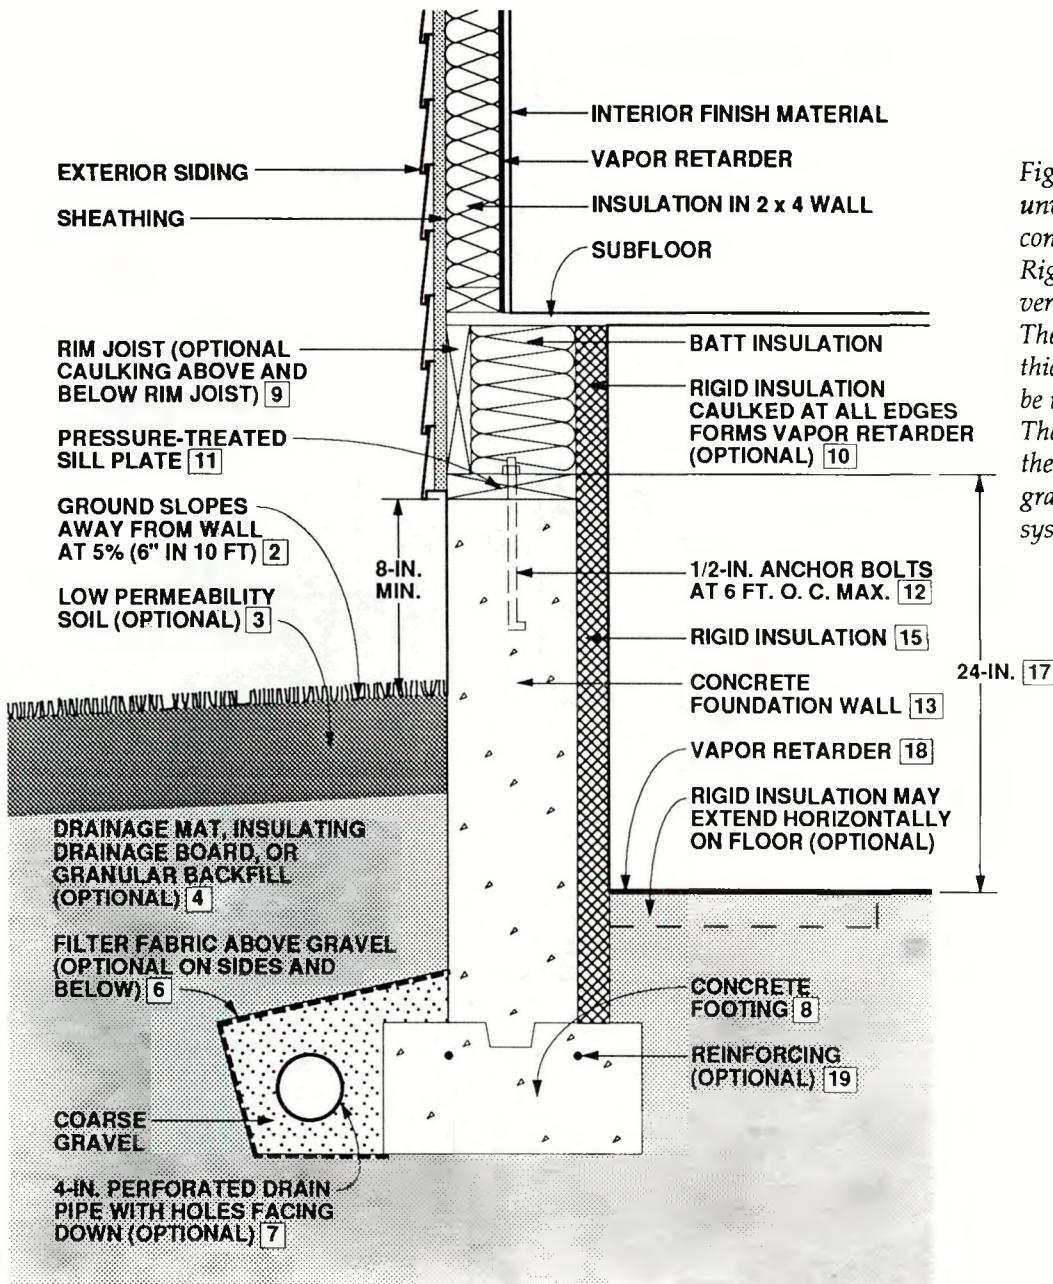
Unvented Crawl Space Wall with Interior Insulation
